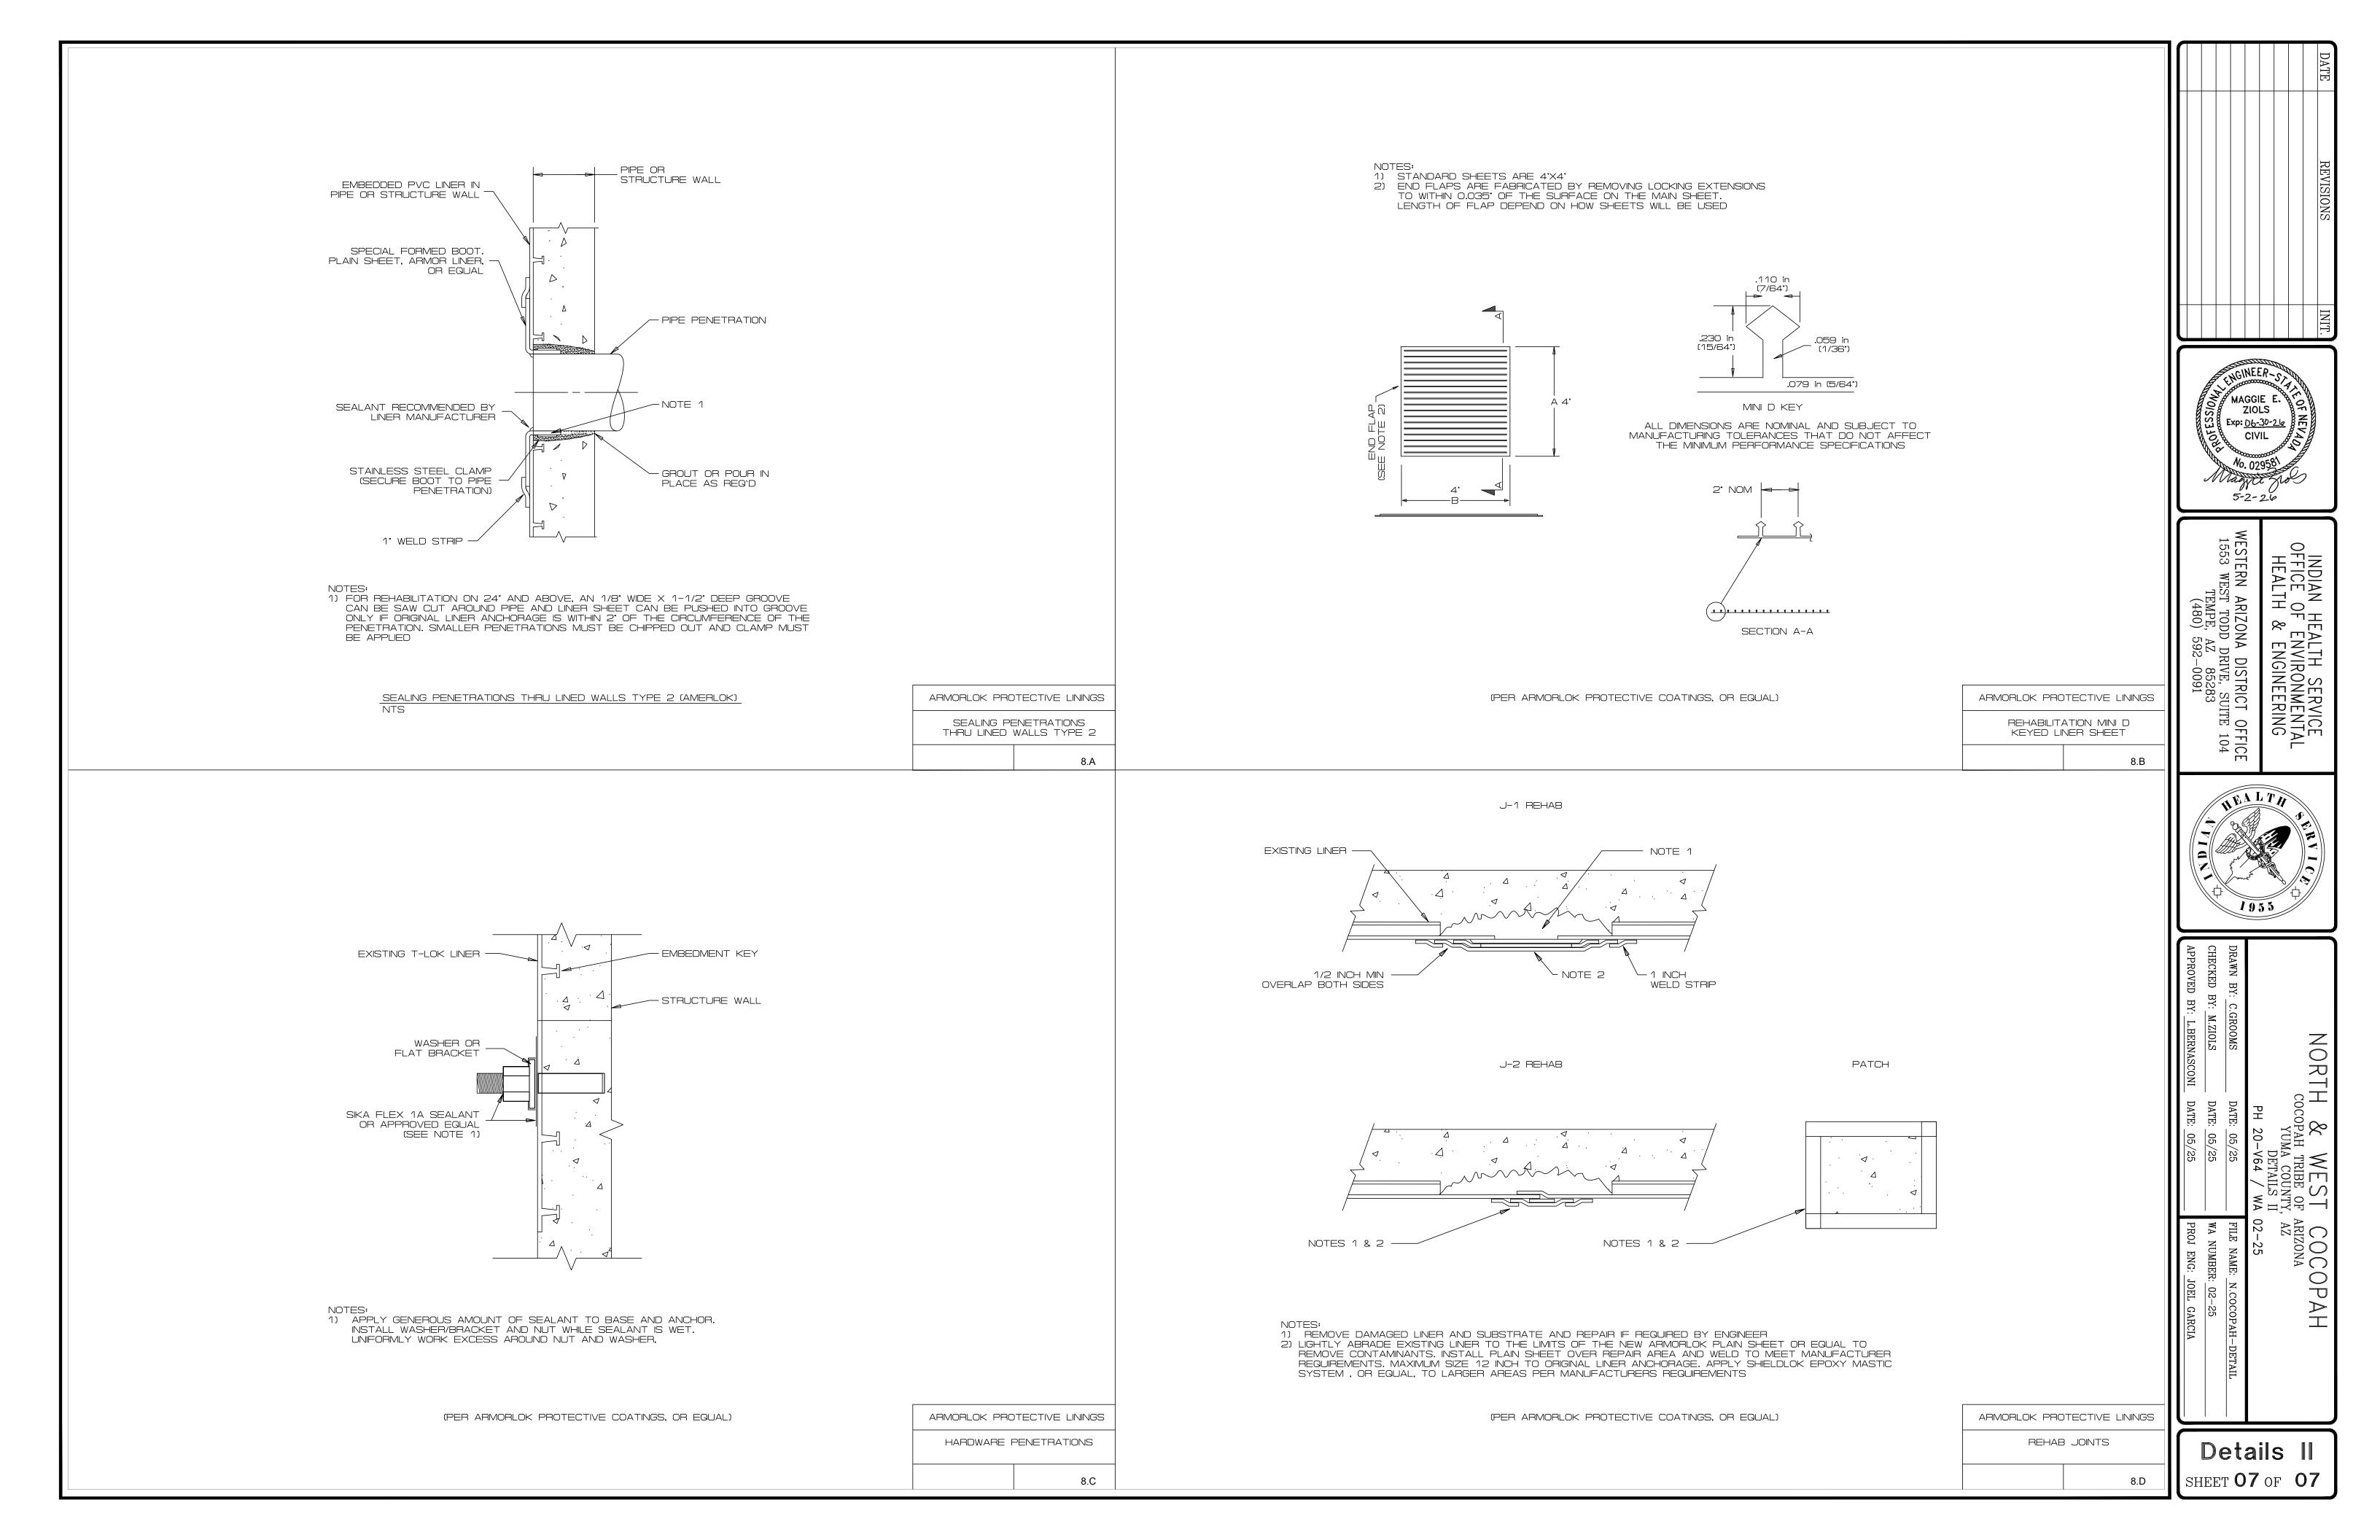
EXHIBIT A: COCOPAH NORTH & WEST MANHOLE INSPECTION & RECOMMENDATION REPORT – 2018
